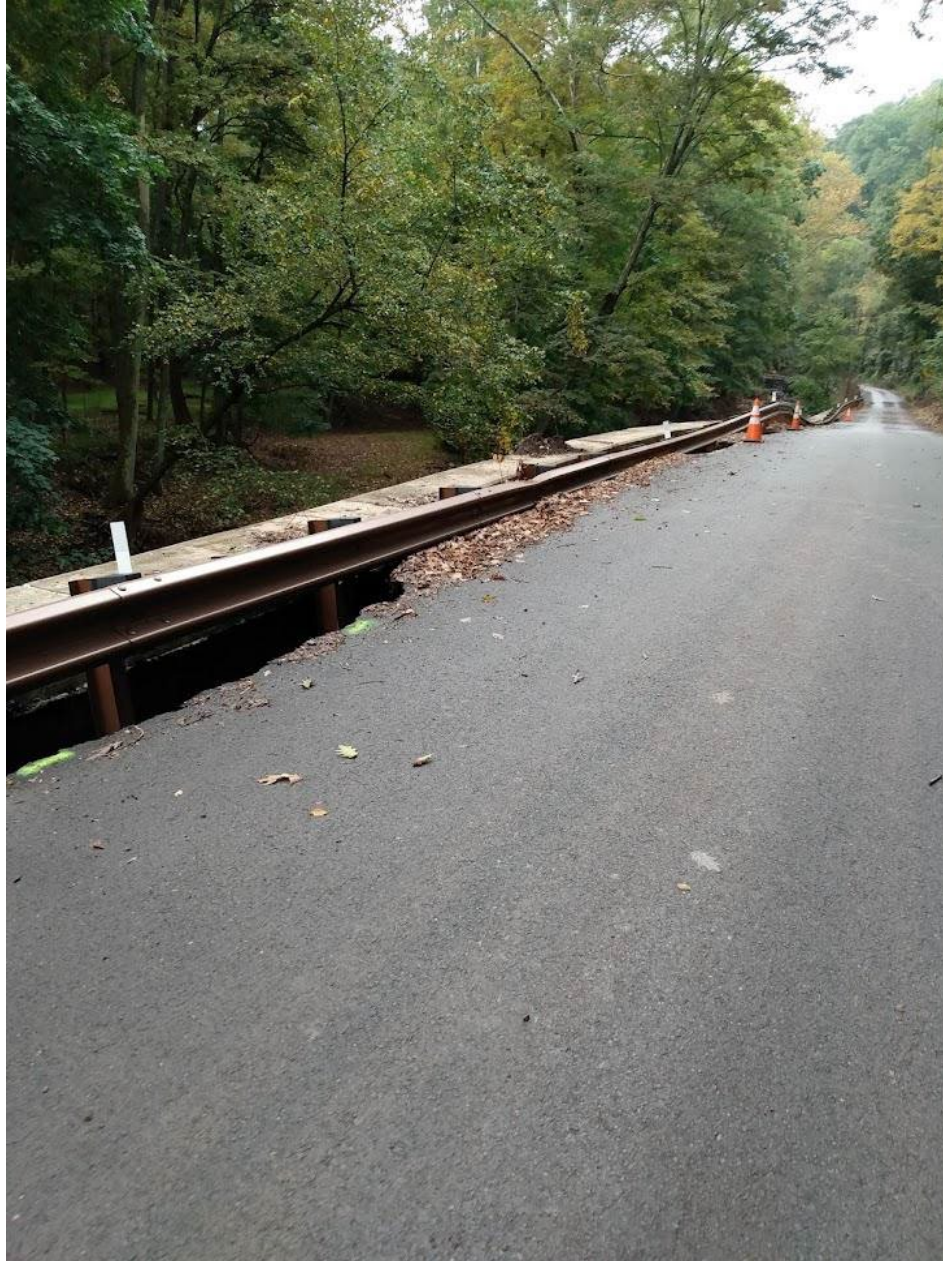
Erosion and Washout leading to Lost Support of Guide Rail (40.397806, -75.05525).
